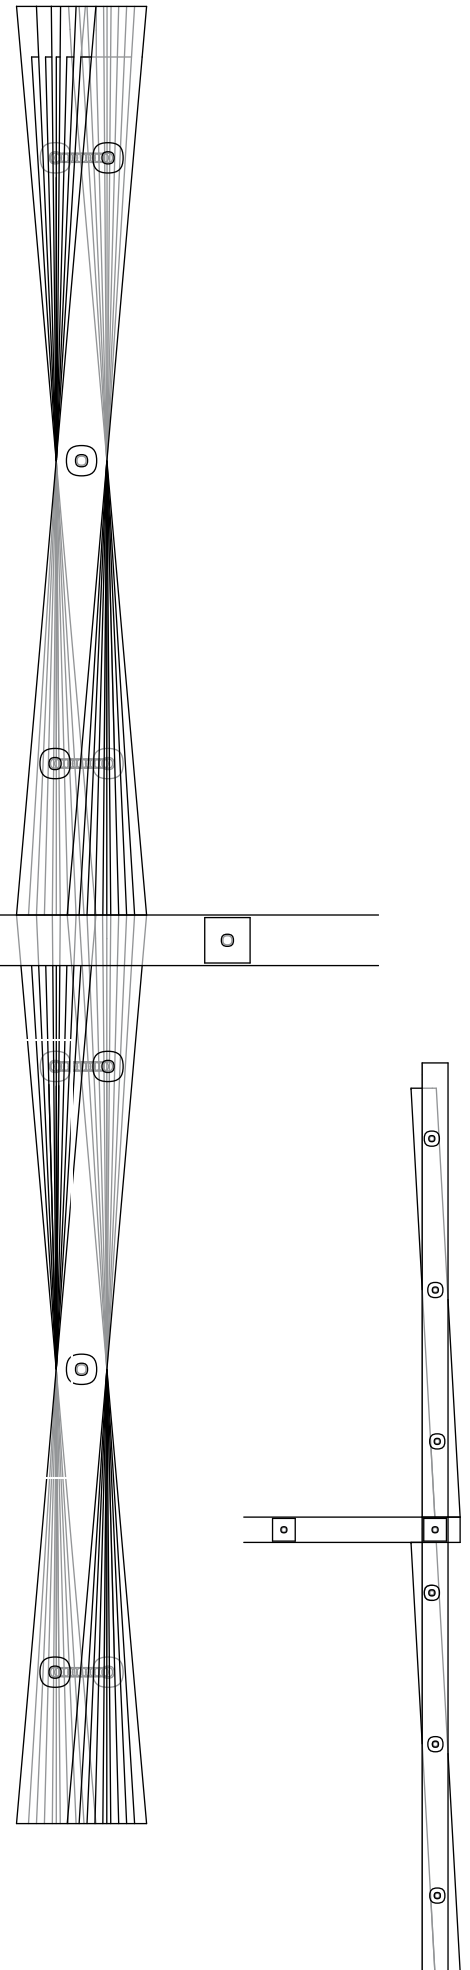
Drawing showing a potential column-to-floor connection with enhanced resistance to rotations from the combination-type stress-laminated columns.
